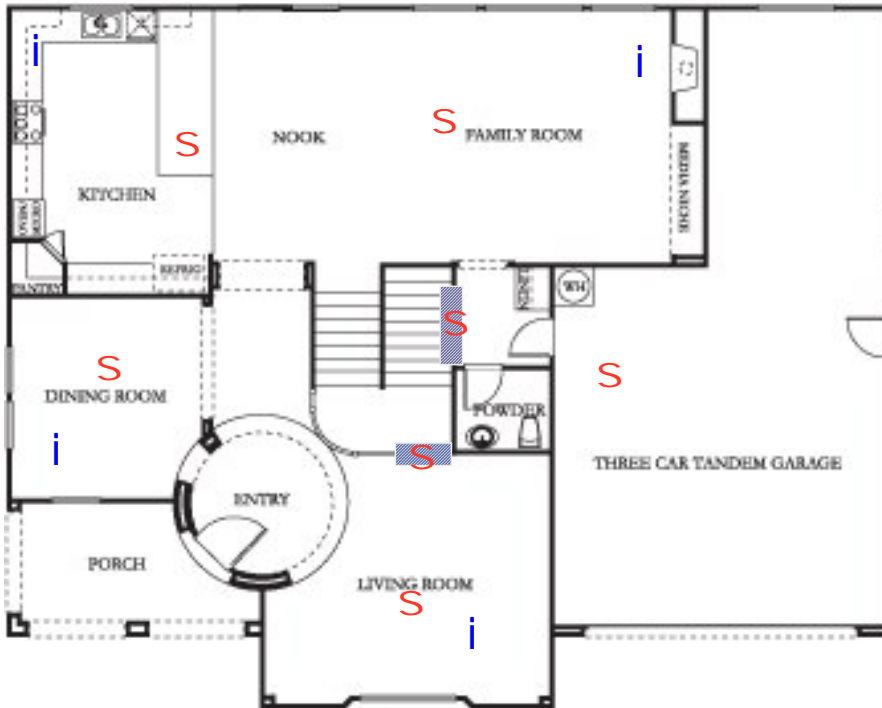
Ground floor plan for tight house showing injection (i) and sampling (s) locations.
